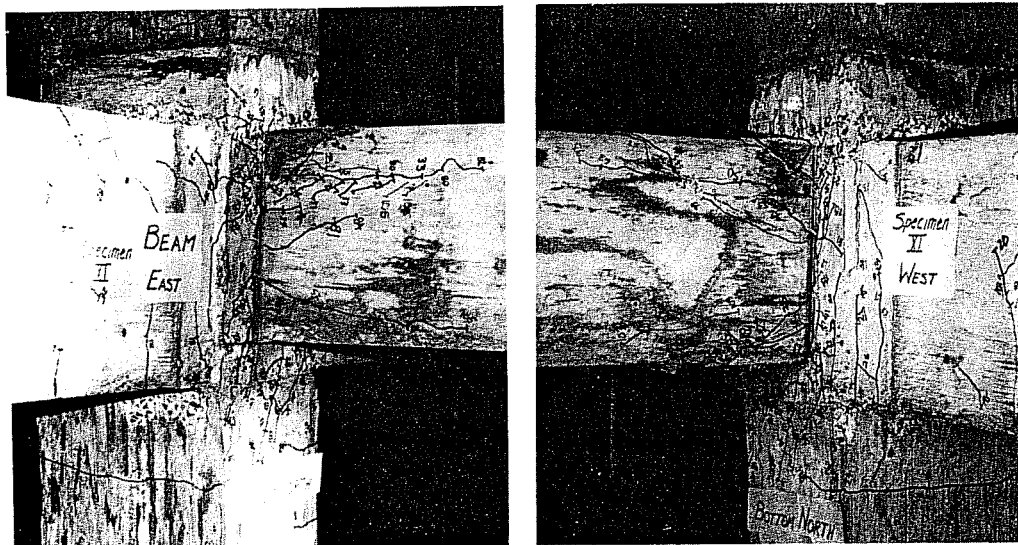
Cracking pattern in joint area of Specimen XI
